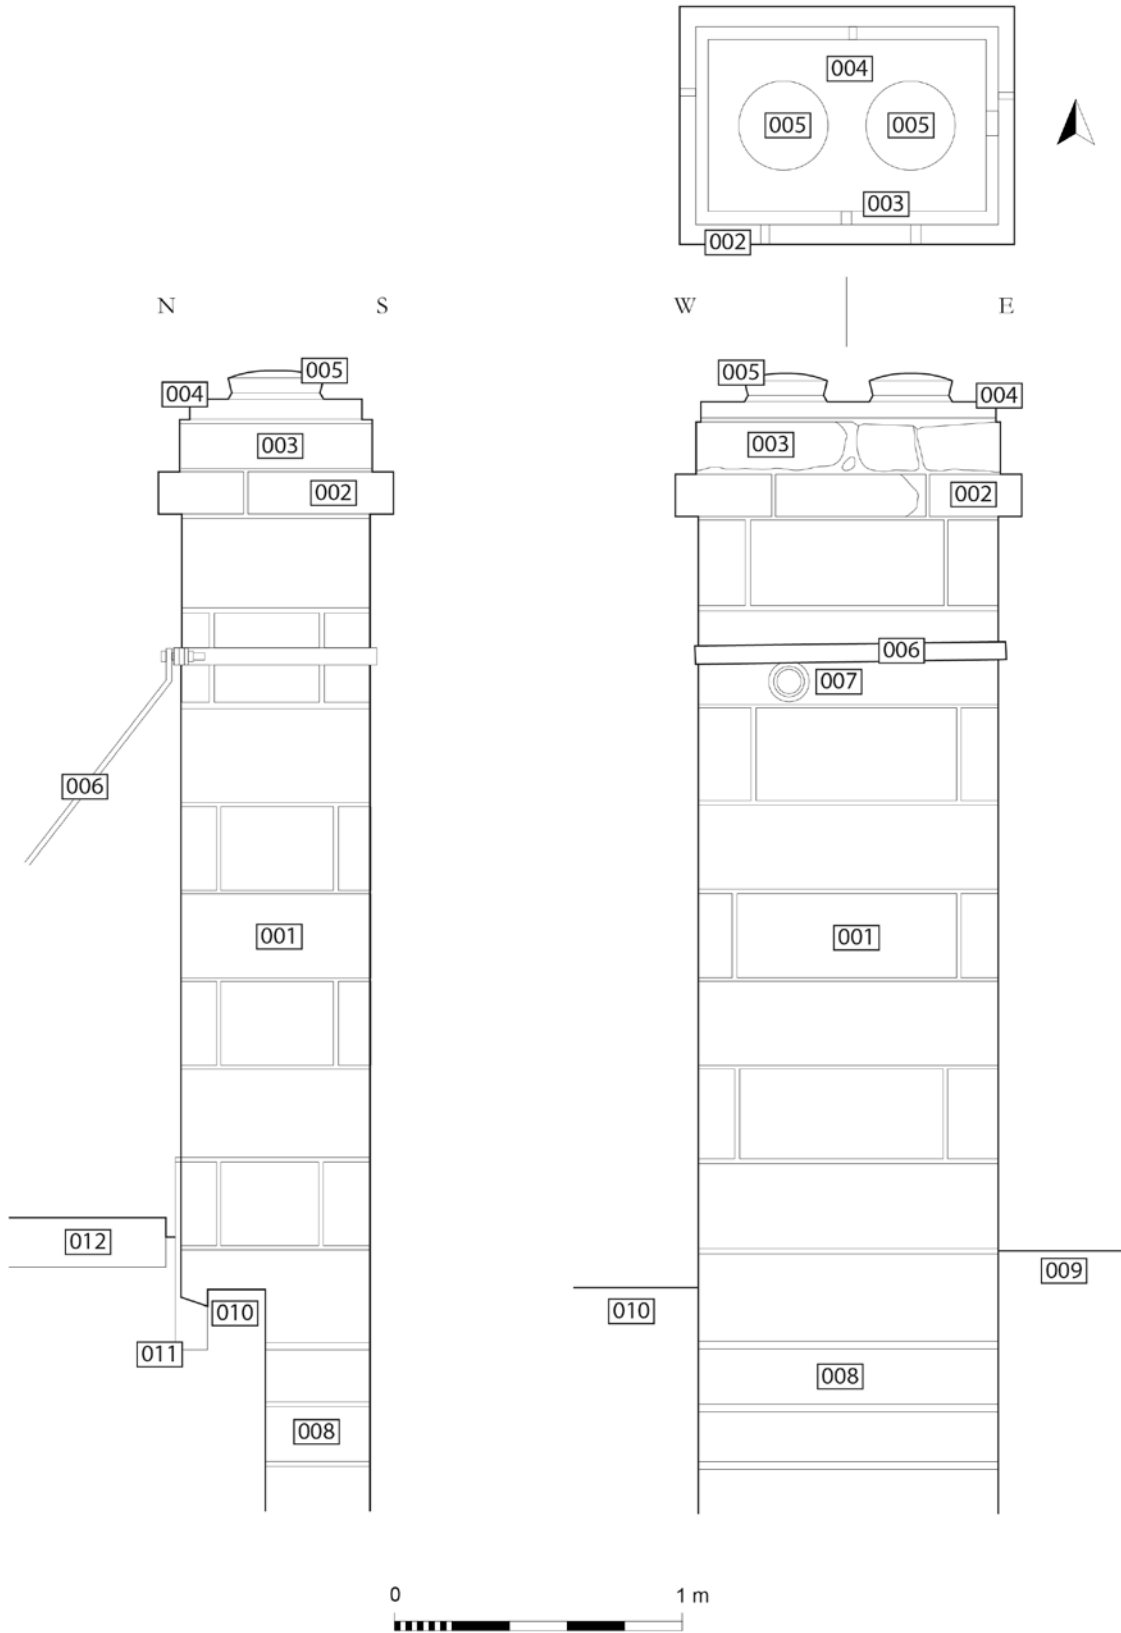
Chimney RC13, western elevation (left), southern elevation (right), and plan (top).
